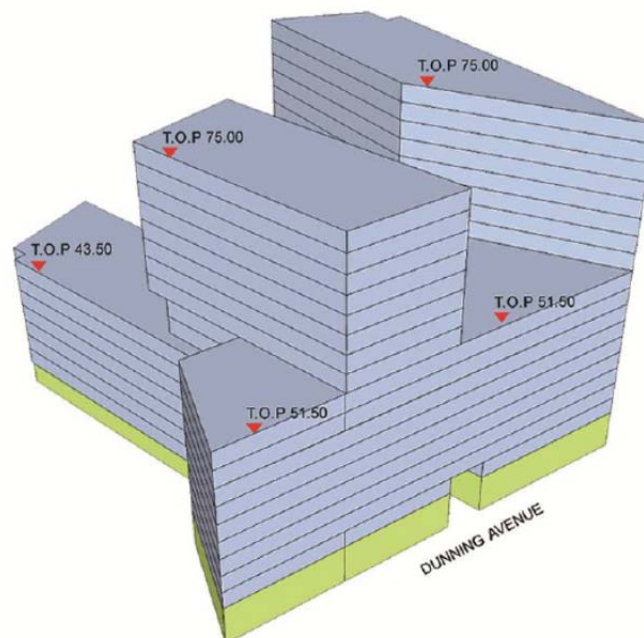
Approved Building Envelopes – corner future Ebsworth Street and future Tweed Place
